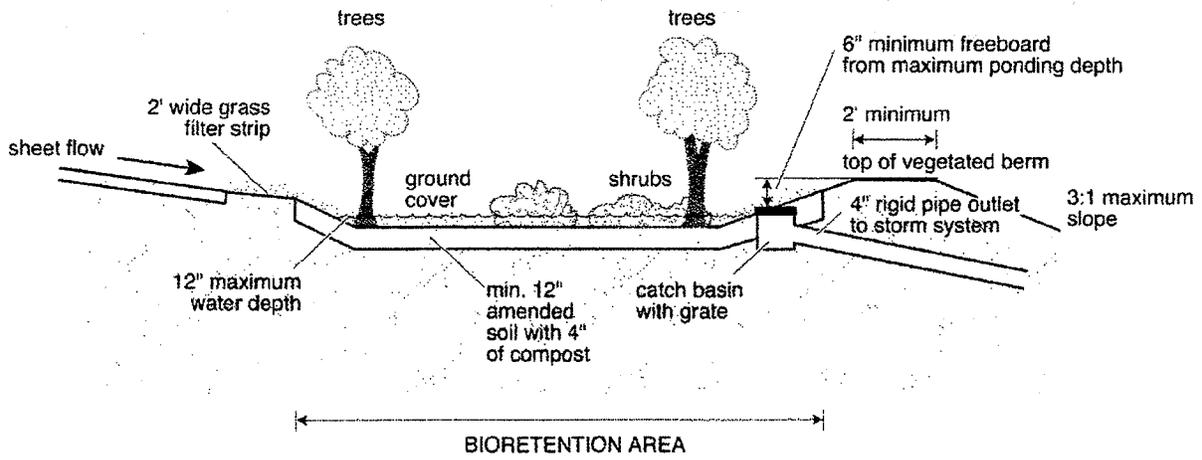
A TYPICAL RAIN GARDEN (BIORETENTION POND)
